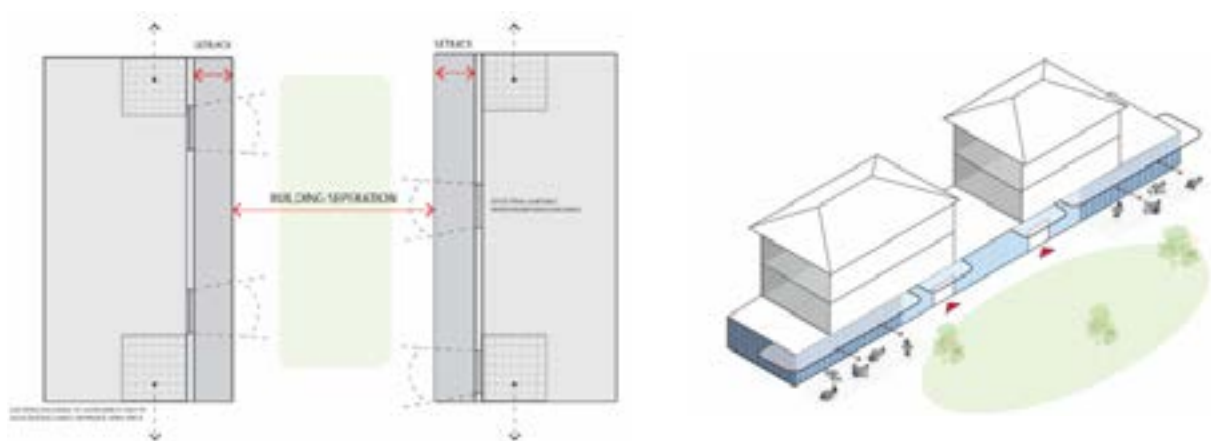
Examples of building separation, setbacks, privacy screening, window offsetting and balcony placement to ensure visual privacy
